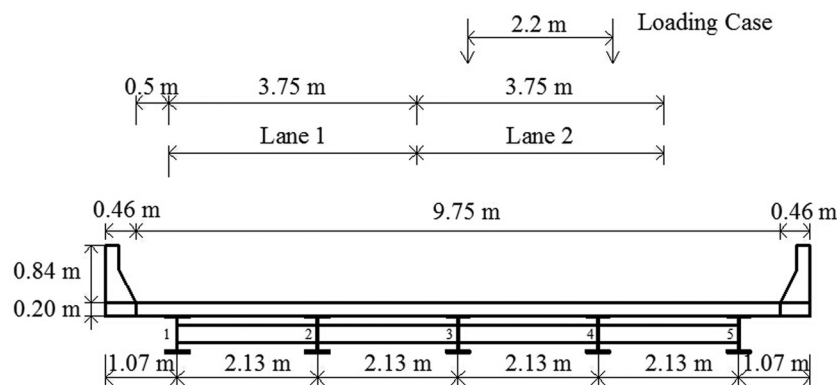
Typical cross section of bridges considered and vehicle loading position adopted
